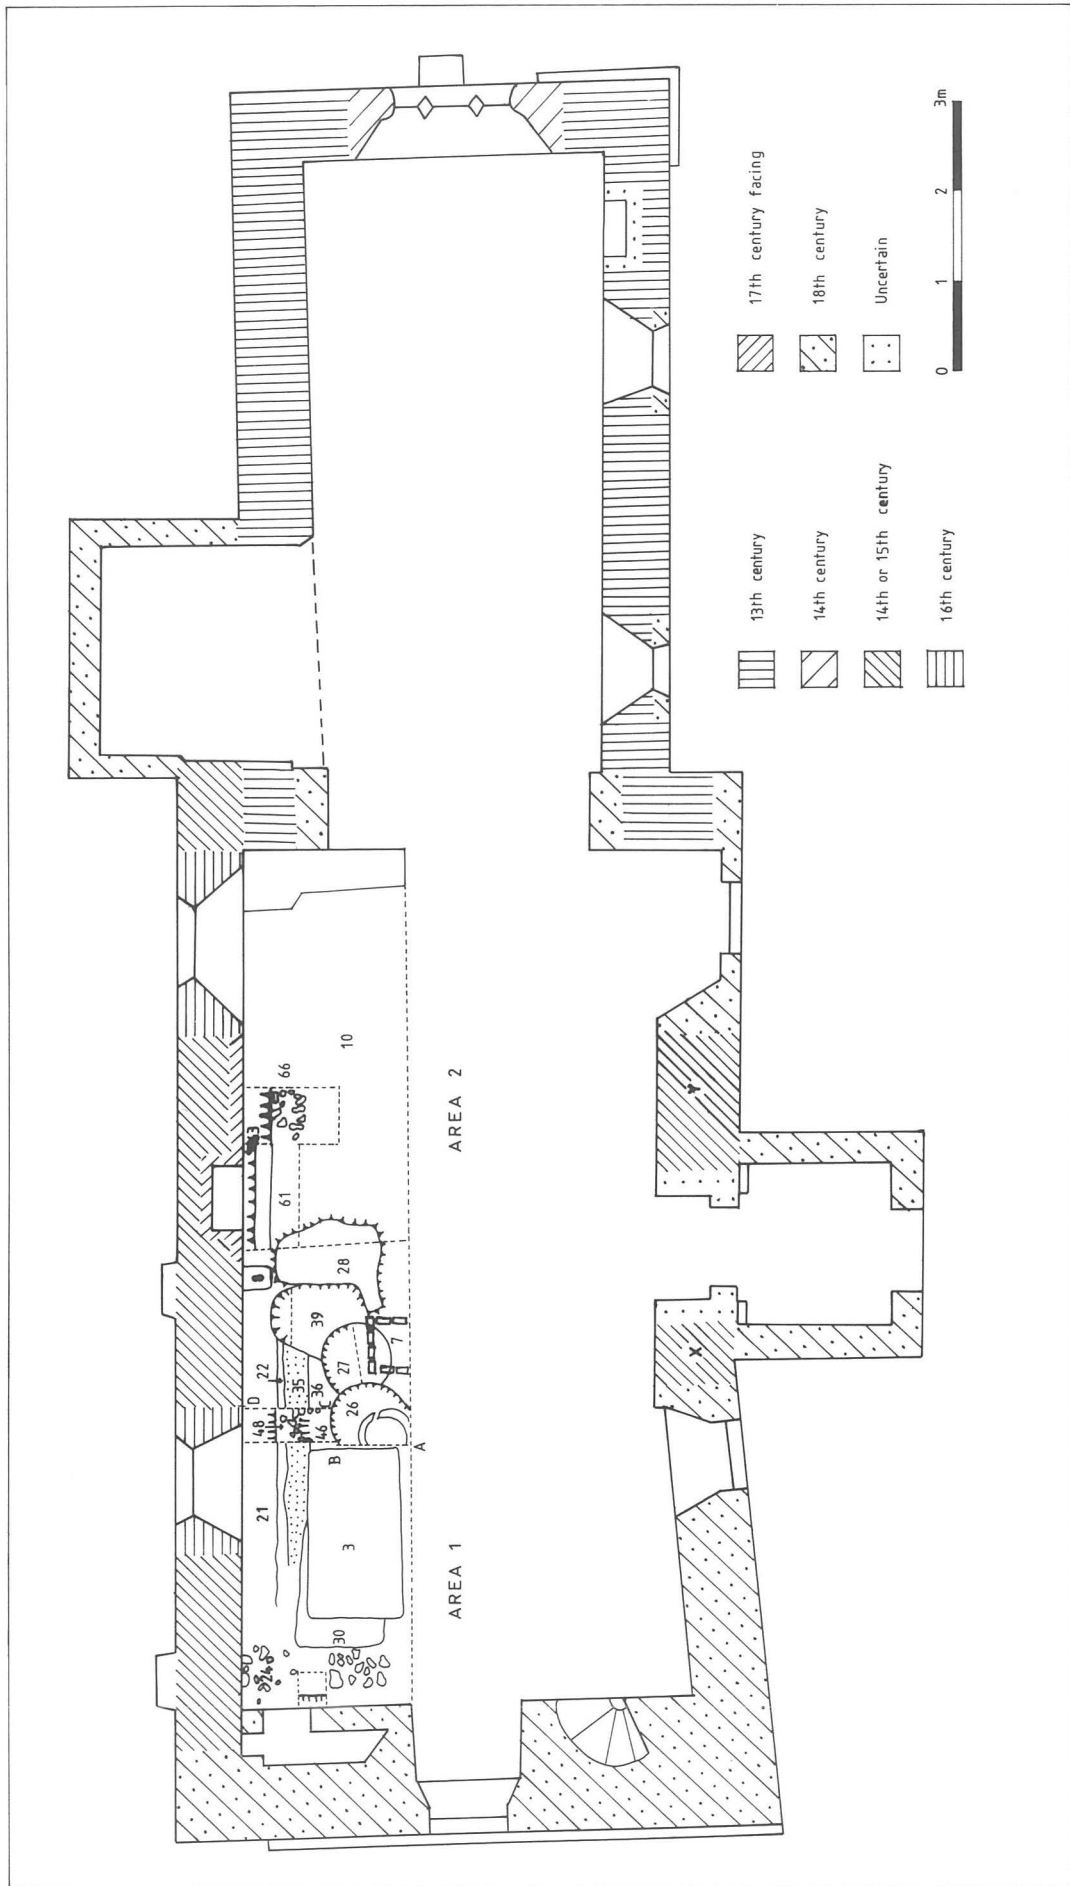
Plan of All Saints Church, Chalbury, showing excavated areas.
